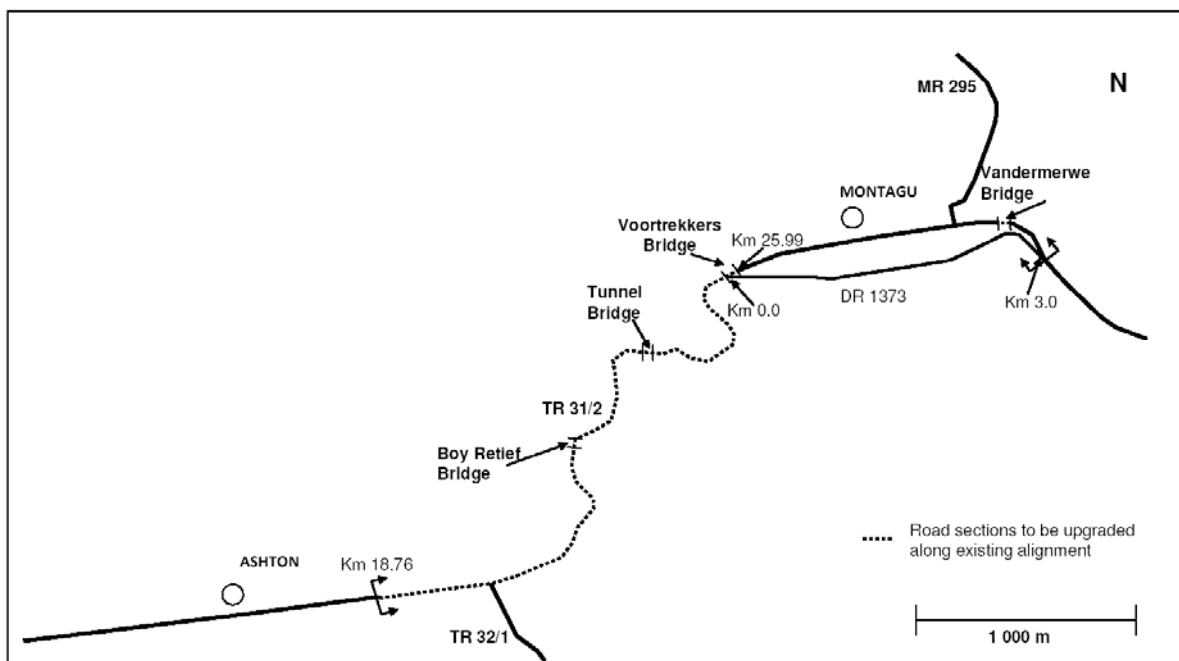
Plan showing the locations of the specific bridges included within the study area. Note that the historic rock tunnel is located immediately east of Tunnel Bridge (a.k.a. Billy Loftus Bridge). TR32/1 leads to Swellendam.
